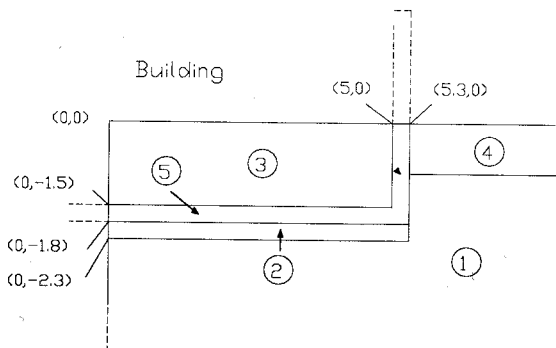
Model subdivision for different material properties: undisturbed underground (material 1), compressed underground (2), air in the building (3), vegetable soil (4) and wall/foundation (5).
